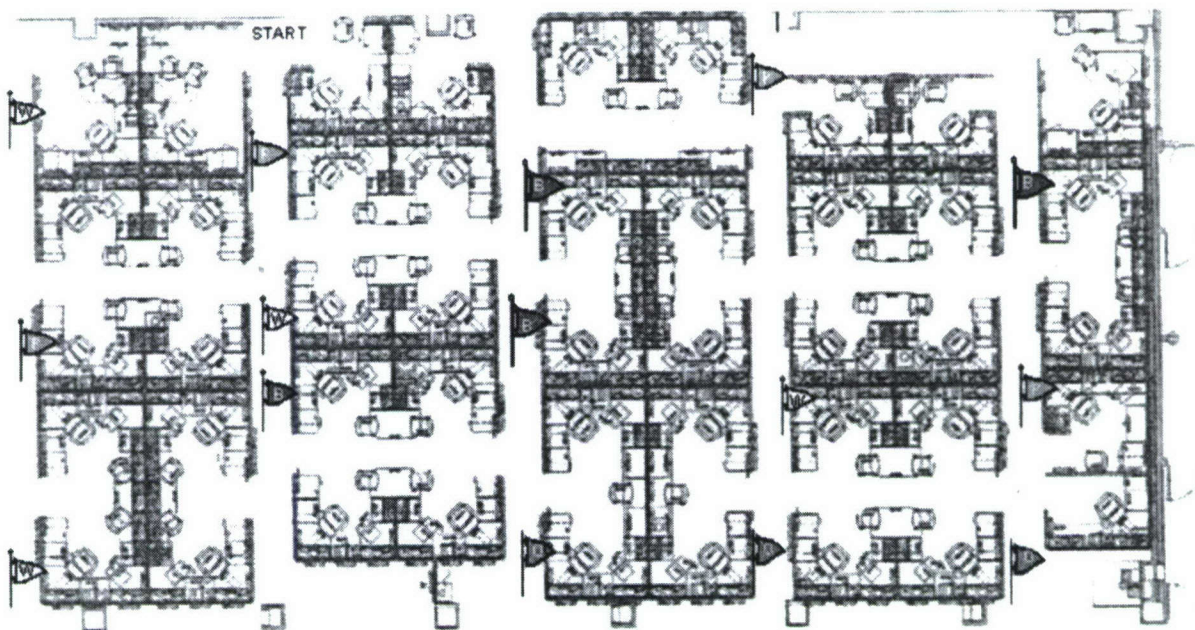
Floor Plan Used for Paper Map Rehearsal
